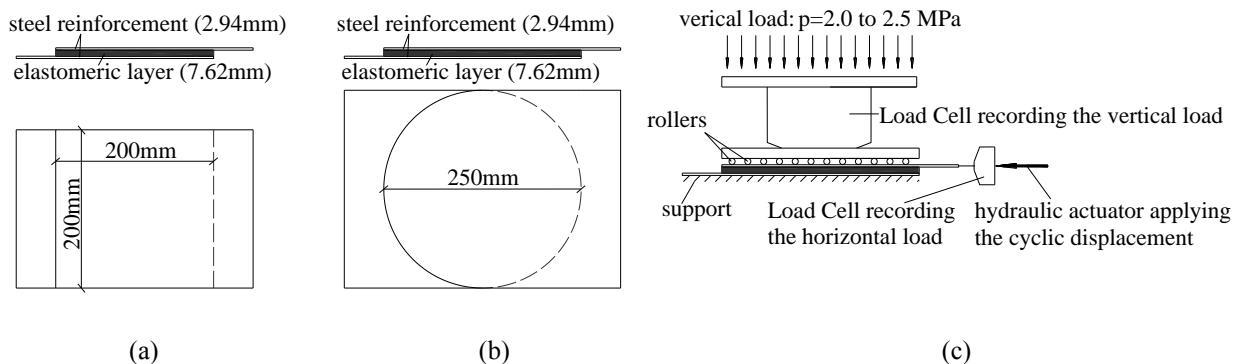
Cross sections and plan views of: (a) Rectangular specimens (200x200x13.5(7.62)mm) and (b) cylindrical specimens (Ø250x13.5(7.62)mm), (c) testing arrangement.
